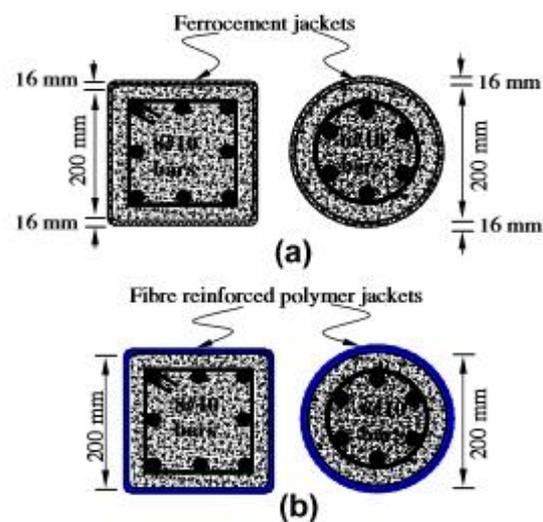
Arrangement of reinforcing bars: (a) ferrocement jacketed columns and (b) FRP jacketed columns (M. Yaqub et. al (2013))
